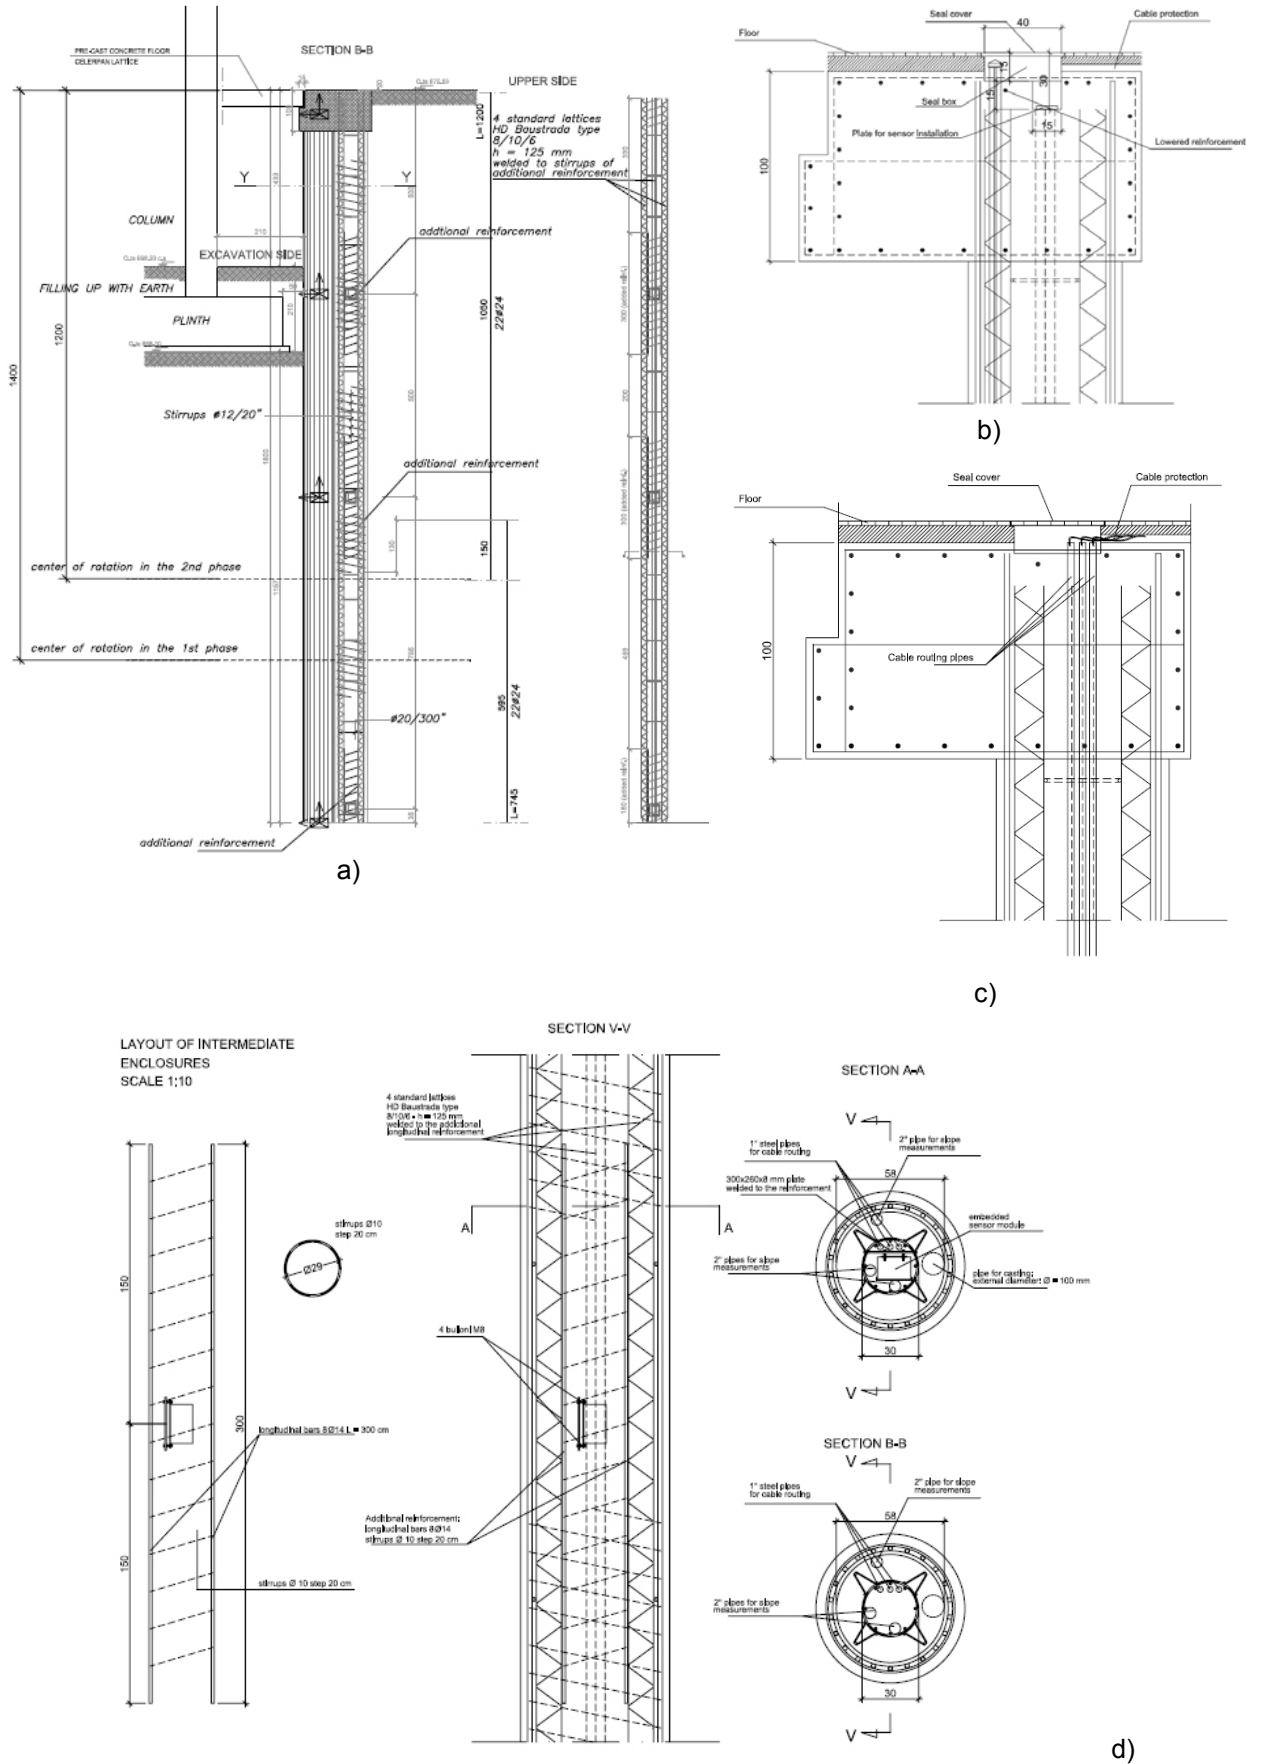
Sketch of piles instrumentation: a) vertical position of the sensors; b) and c) details of piles head and sensor housing; d) layout of intermediate enclosures.
